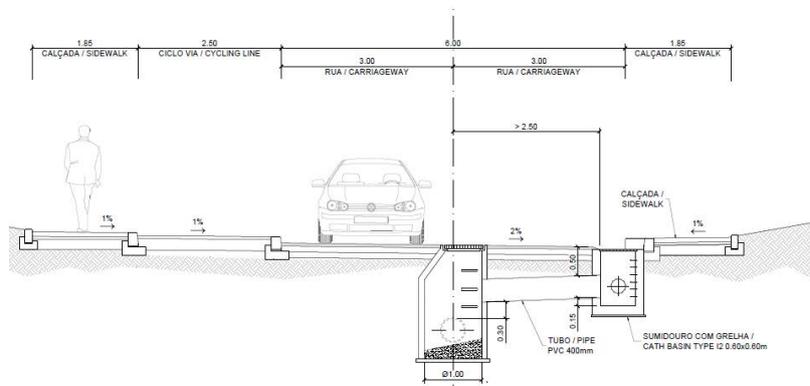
Typical section Pantufo Coastline (7+370 – 7+630).
